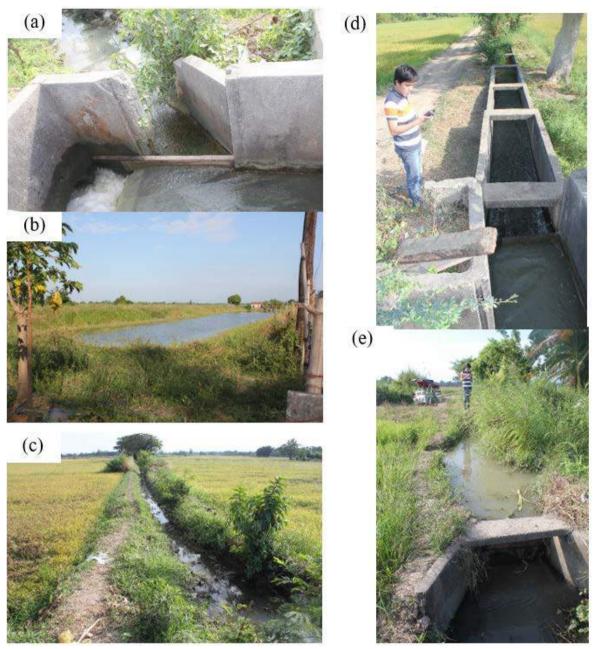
A-7. (a) A typical control structure combining a turnout (using wooden slabs), a drop and a road crossing; (b) one of several fishponds being served by the PIS; (c) a typical unlined lateral; (d) continuation of the concrete-lined main canal with control structure combining turnout (wooden slabs) and drop structure; (e) the end check of the main canal, from here on the canals are unlined.
